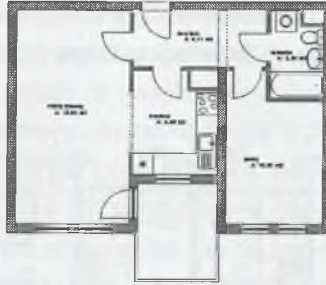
Plan of a multi-family building at Naramowicka Street in Poznań. Developer's archive
